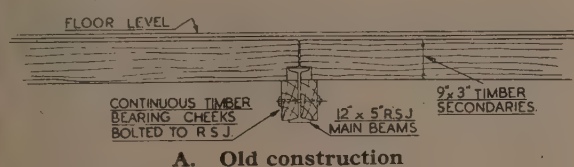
Strengthening of Steel beams to carry new concrete floor
